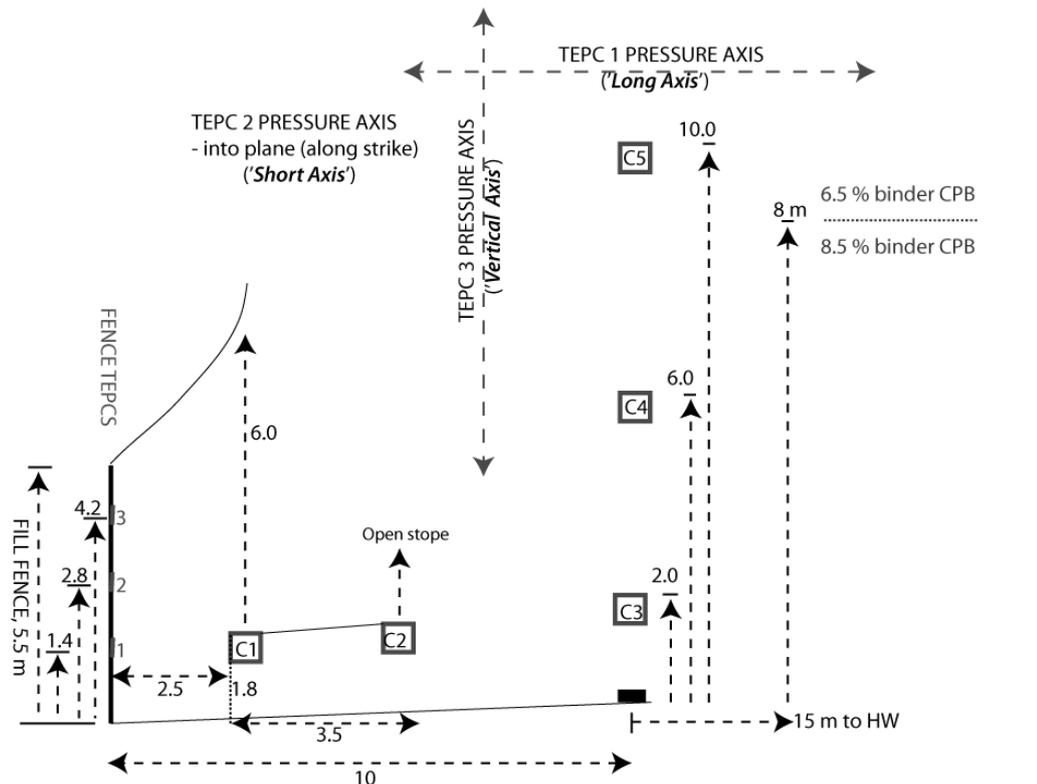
Cross section of 685N20 stope showing stope dimensions (in metres), and cage (C) and fill barricade instrument locations. The vertical, long and short TEPC axes are indicated
